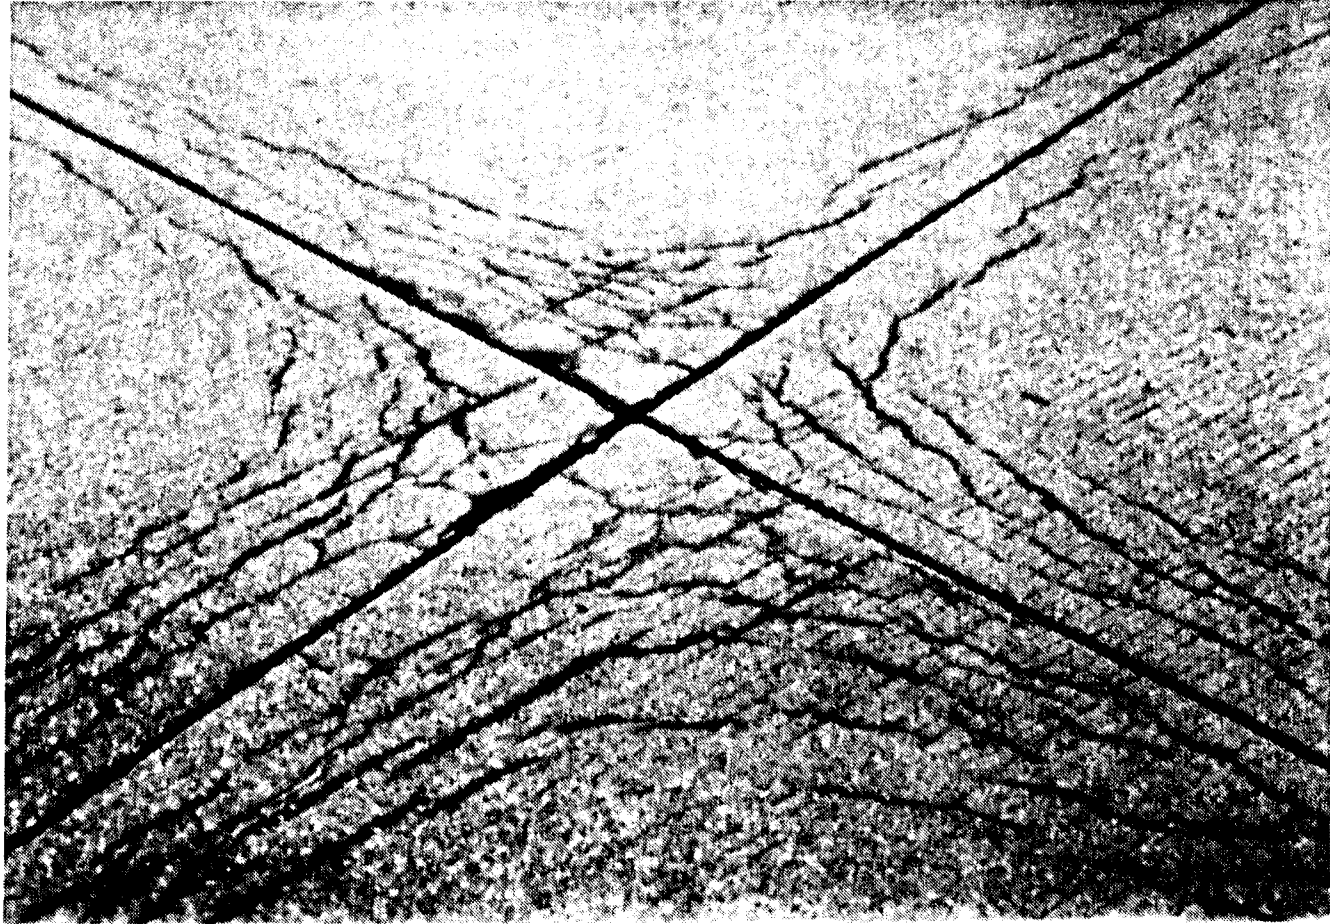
TYPICAL D CRACKING OF PCC PAVEMENT
